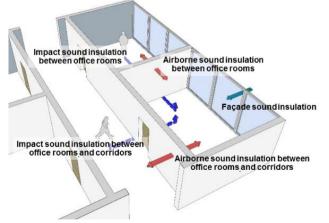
Sound insulation between adjacent office rooms, towards corridor and of façade.
